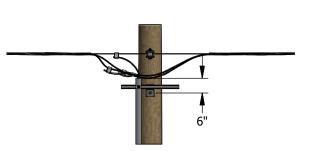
SECONDARY AERIAL CABLE TANGENT CONSTRUCTION FRONT VIEW
